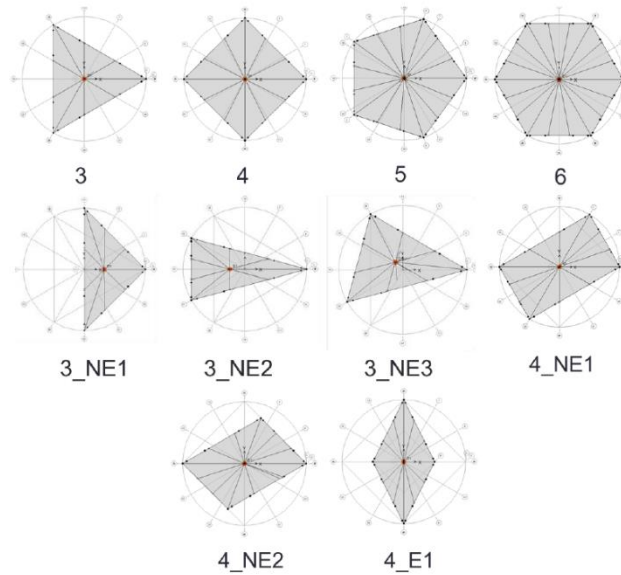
Geometric Floor Layouts (O'Connor, 2012)
